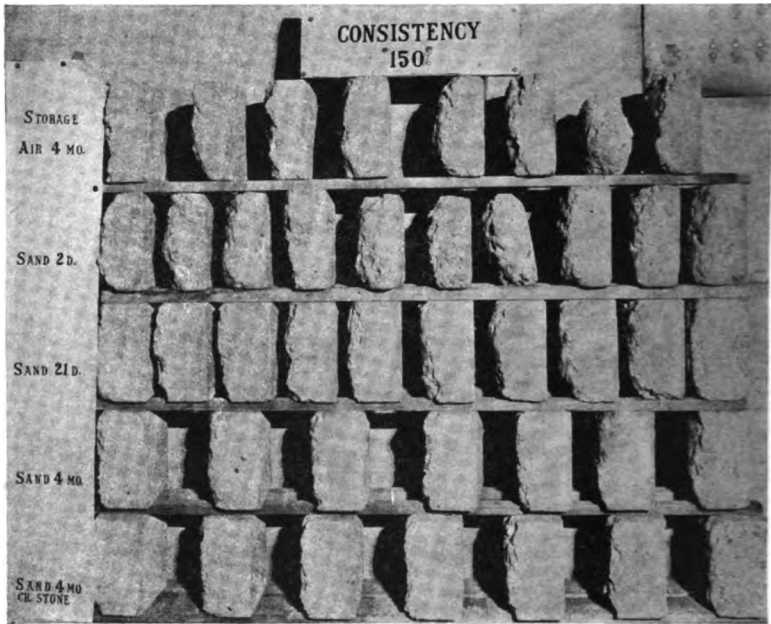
SIDE VIEW OF WEAR BLOCKS AFTER TEST.
